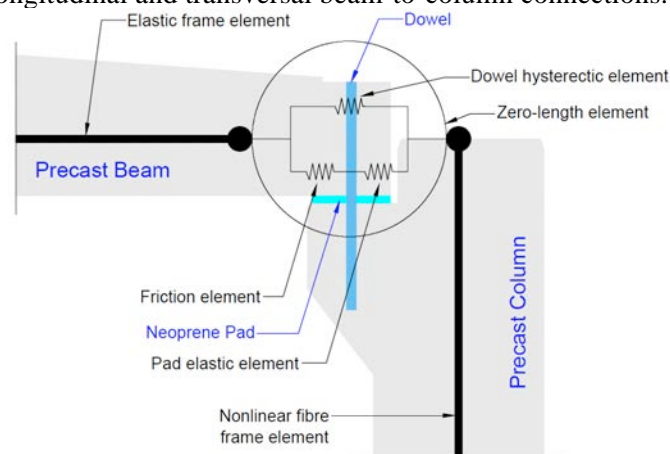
Numerical model adopted to simulate the behavior of the beam-to-column connections
